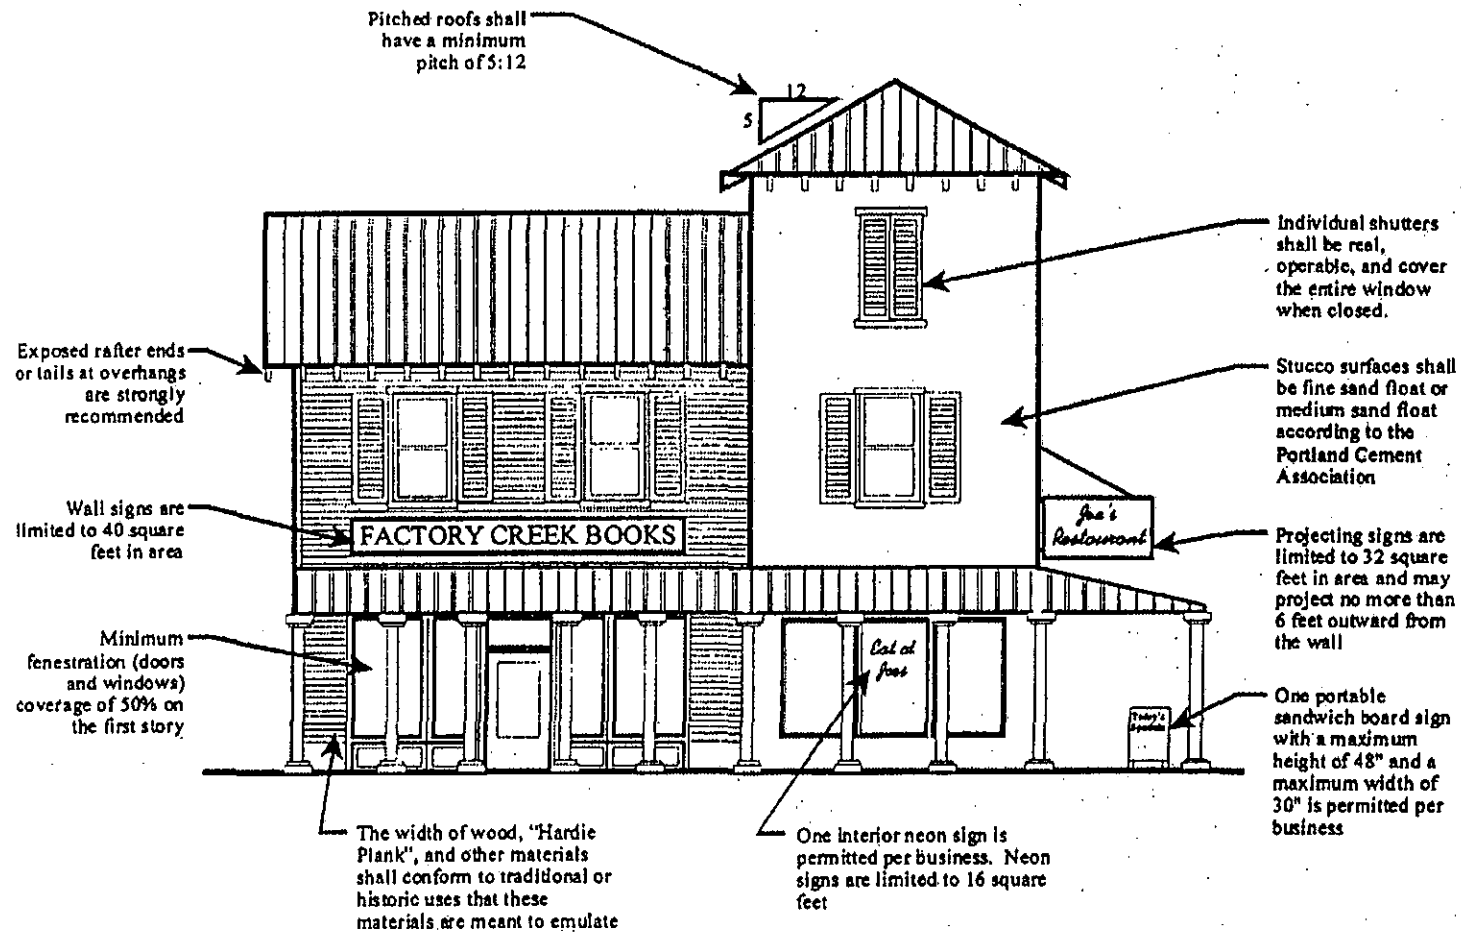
1 Sample Applications of Lady's Island Village Center Design Guidelines
